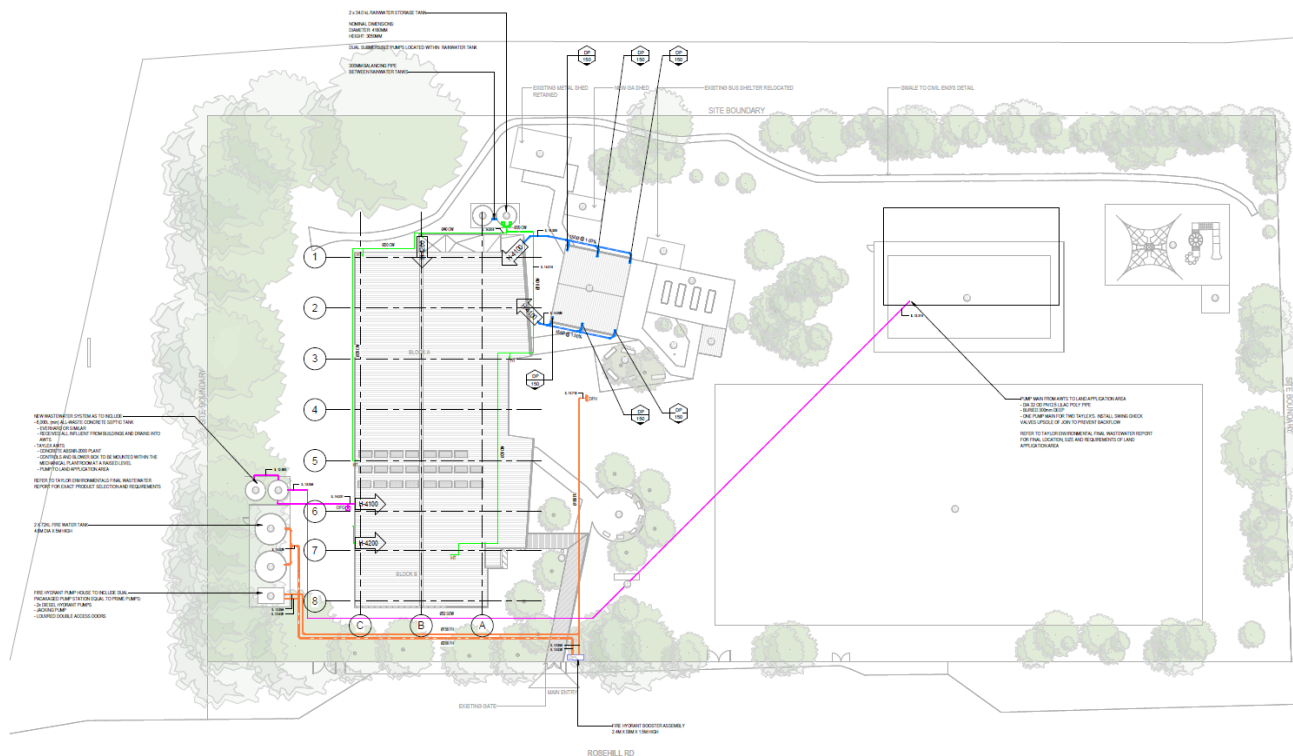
Site plan identifying location of proposed infrastructure and services (Source: JHA)
